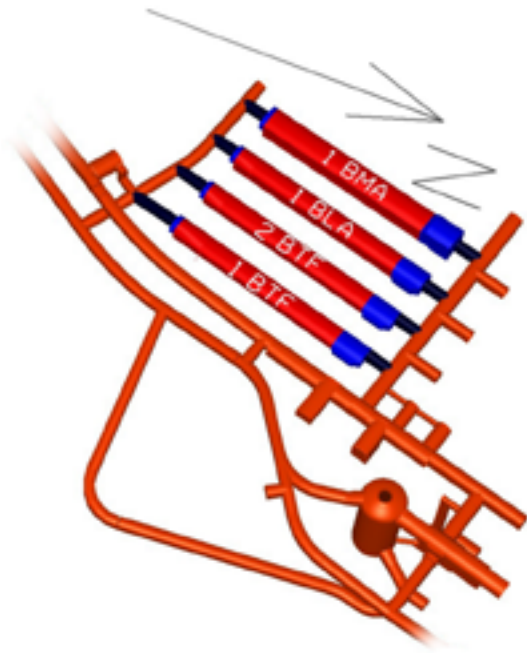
Layout of SFR 1 with the concrete plugs for the rock vaults marked in black. Loading-in and transloading tunnels are marked in blue /Fredriksson 2000/.
